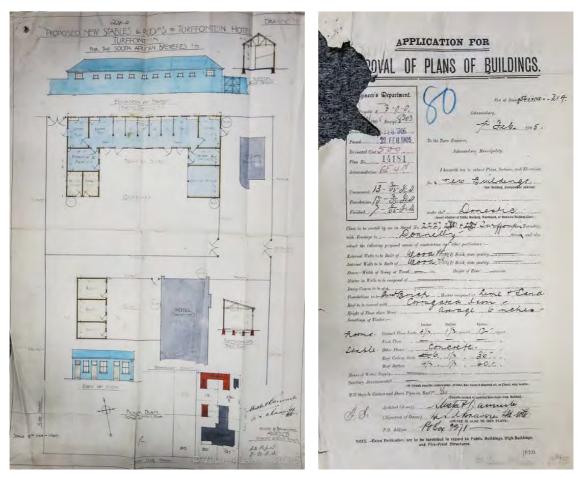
& Fig. 37 Proposed new stables & rooms for Turffontein Hotel and Application of Approval of plans from 1905
